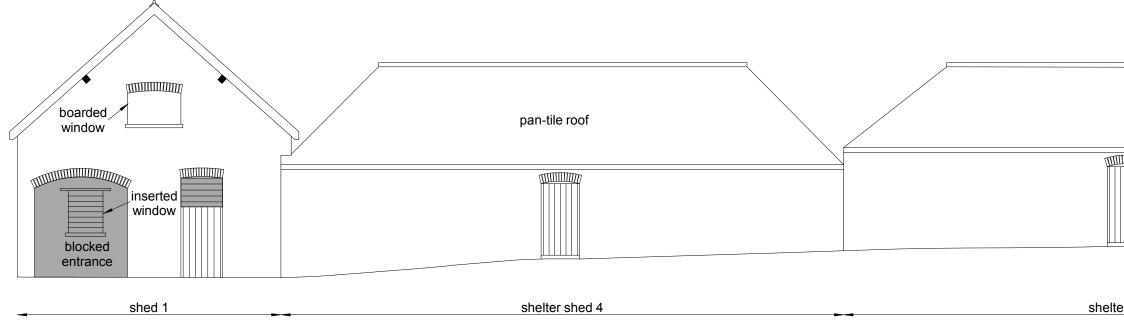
Kitchen Farm, north-west elevation with alterations shaded grey.
